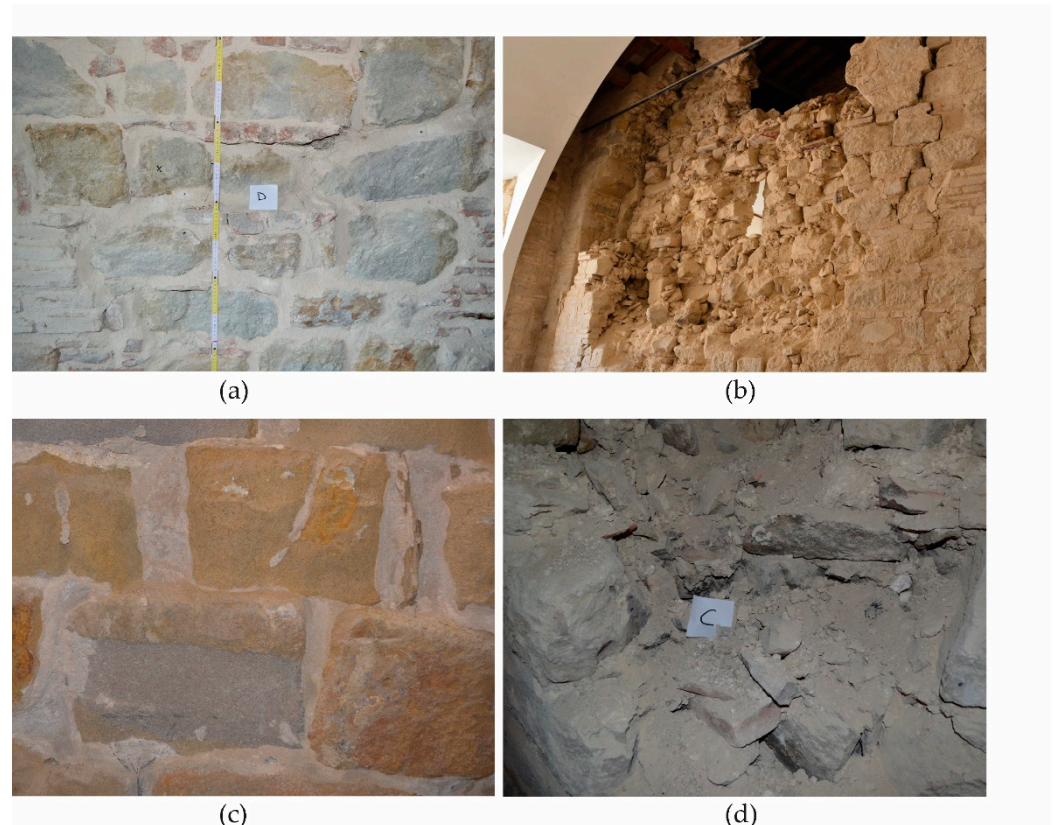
Pictures showing typical masonry face (internal and external) on the left and masonry core of collapsed walls of Palazzo Ducale Palace on the right side. (a) Internal masonry face. (b) Internal masonry core. (c) External masonry face. (d) Detail of internal masonry core.
